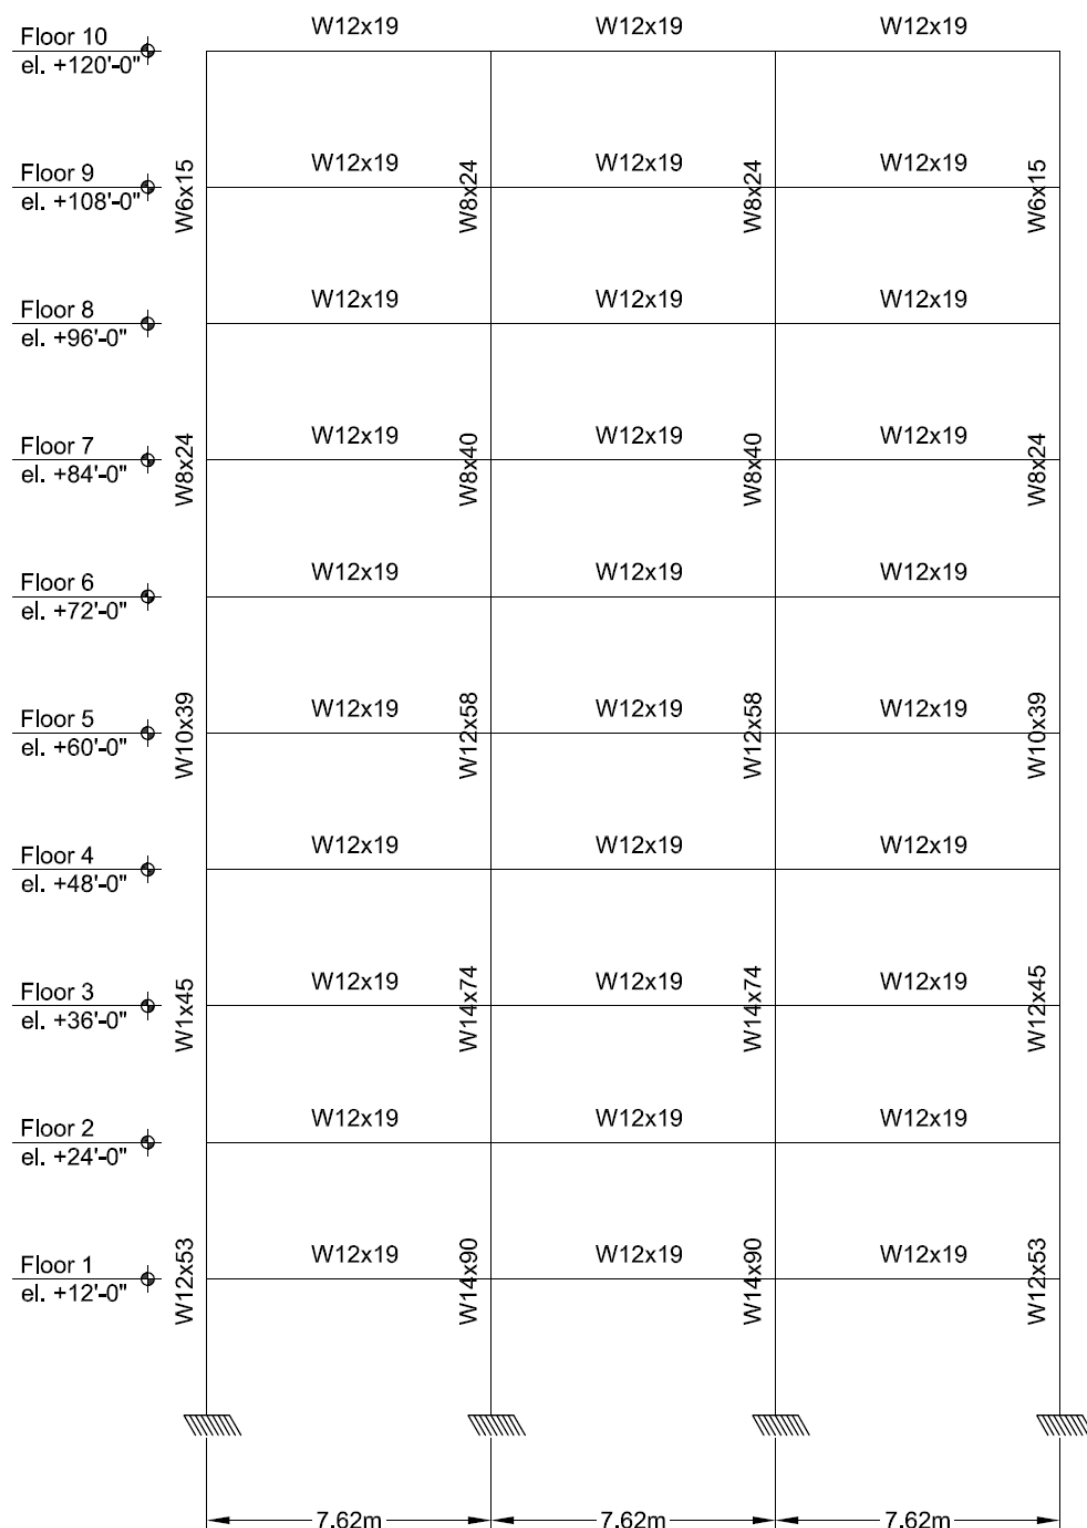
Layout of the structure indicating the columns and secondary beam sections (Fischer et al, 2019)
